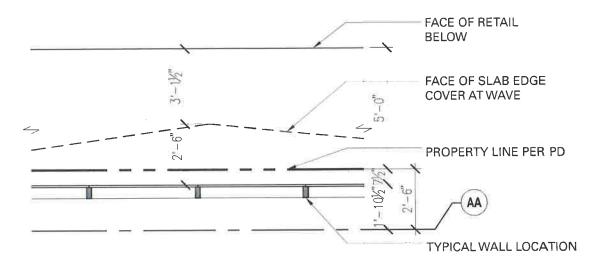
PROPOSED RESIDENTIAL PLAN
